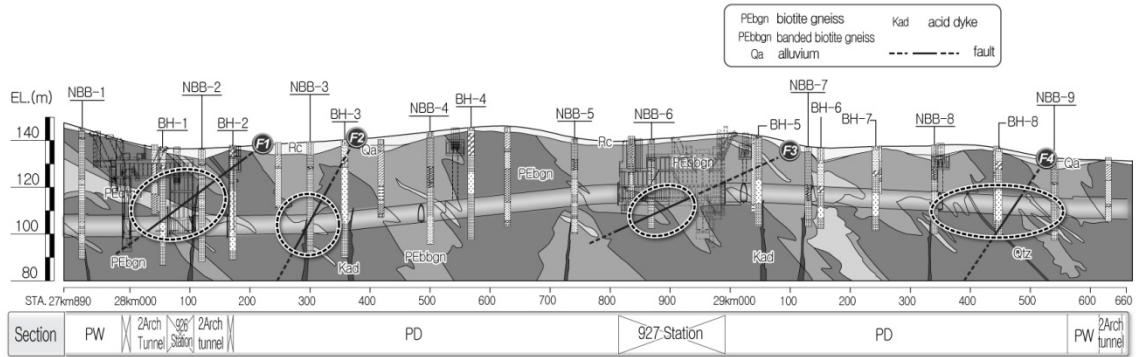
Geology and tunnel longitudinal section (PD: double lane track section, PW: enlarged section)
